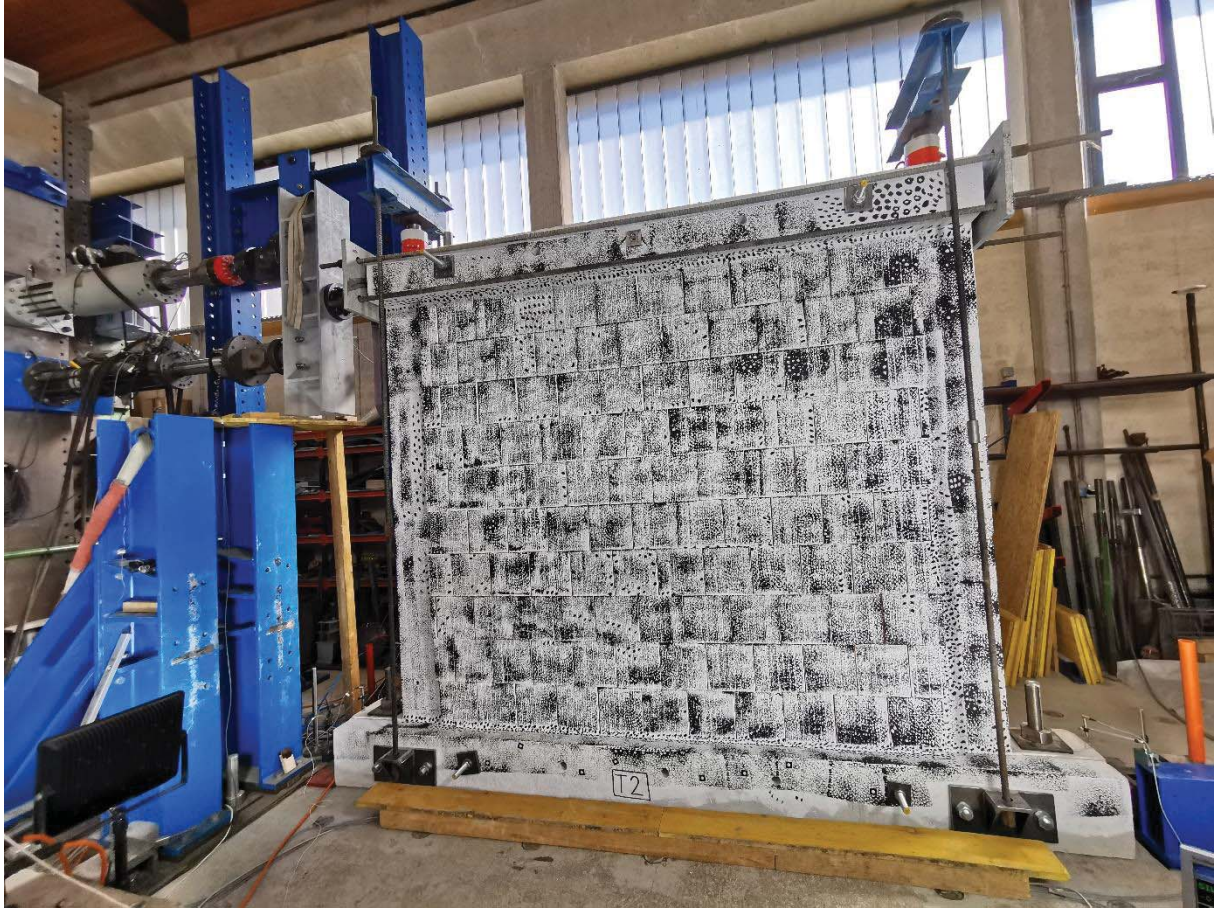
Test specimen with test setup for in-plane movement of the specimen
